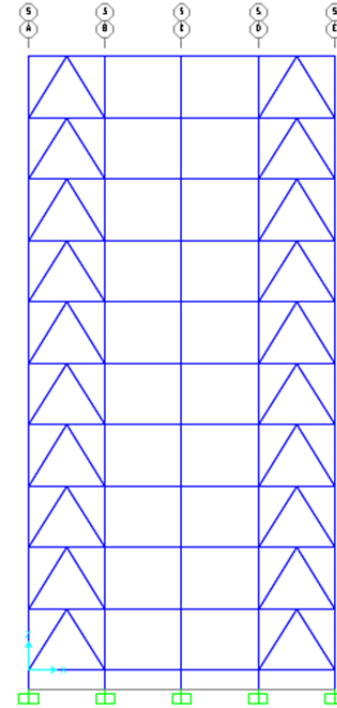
Elevation of Frame in Z direction(vertical) for steel frame with inverted V- Bracing
